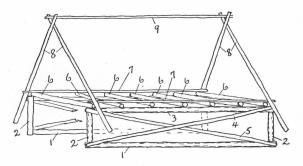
Portable house (whare taka): 1, lower horizontal beam (hapai); 2, upright supporting post; 3, upper longitudinal beam (hapai); 4, 5, diagonal braces; 6, cross pieces; 7, longitudinal wall plates; 8, end pairs of principal rafters; 9, main ridgepole. (Native terminology as in figure 8.)
